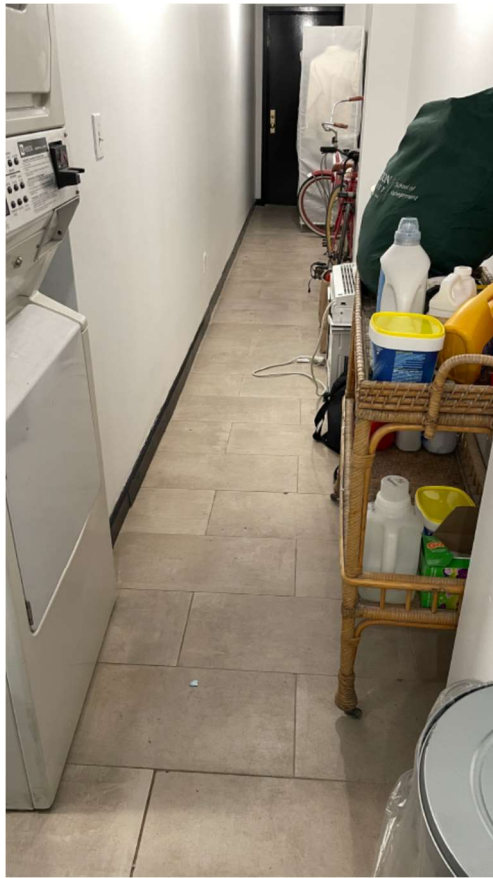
Additional view of tile covered slab in the hallways of 237 Kent Avenue.
